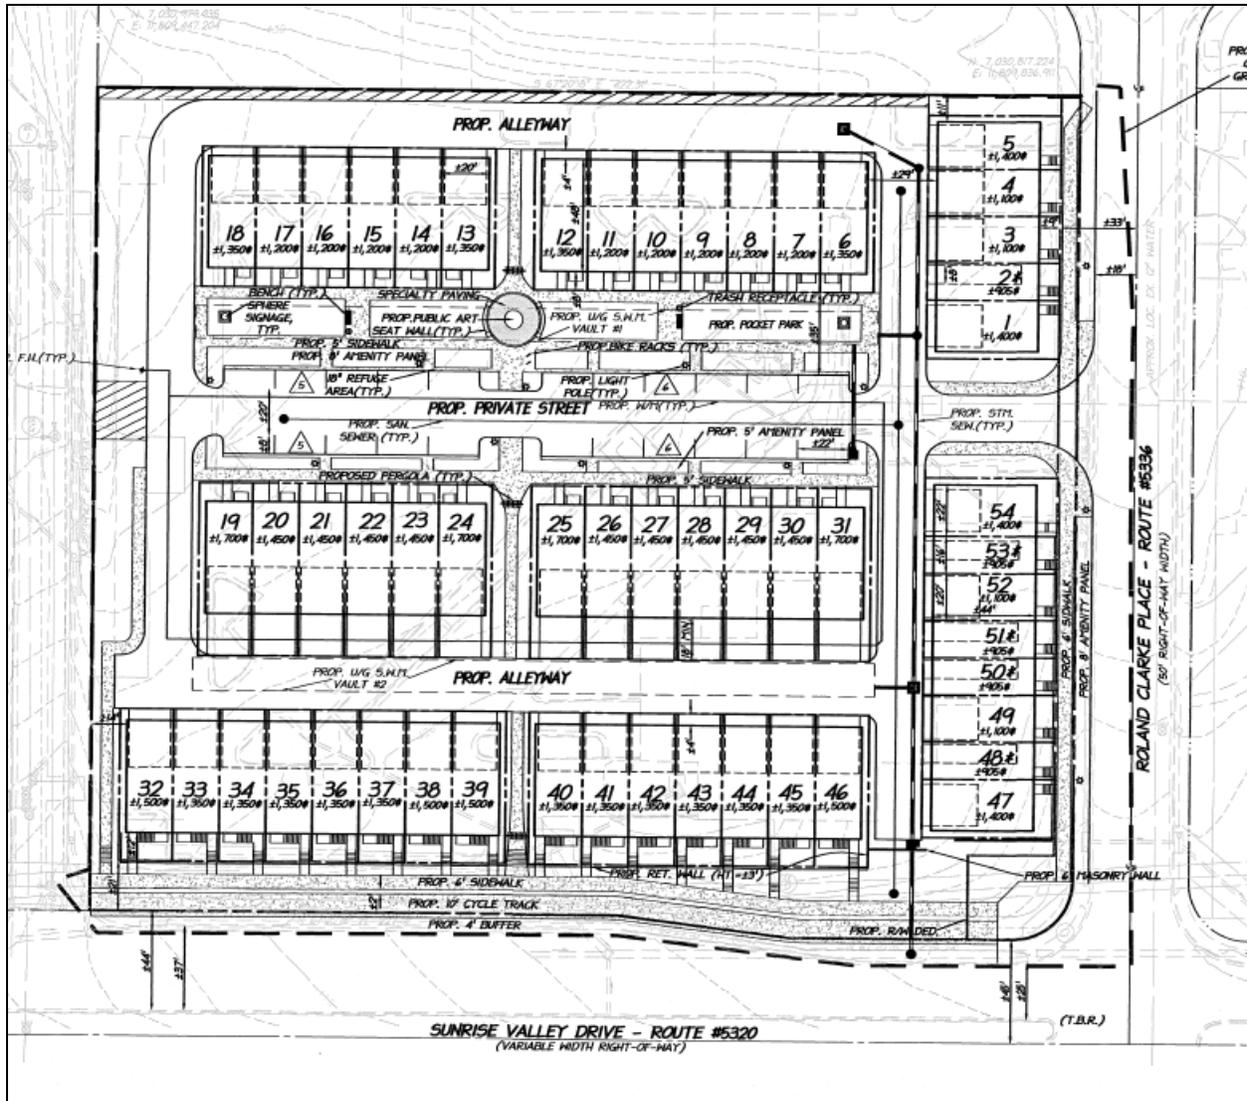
Proposed DPA/PRC/PCA Layout (Source: Applicant, Sheet 3)
